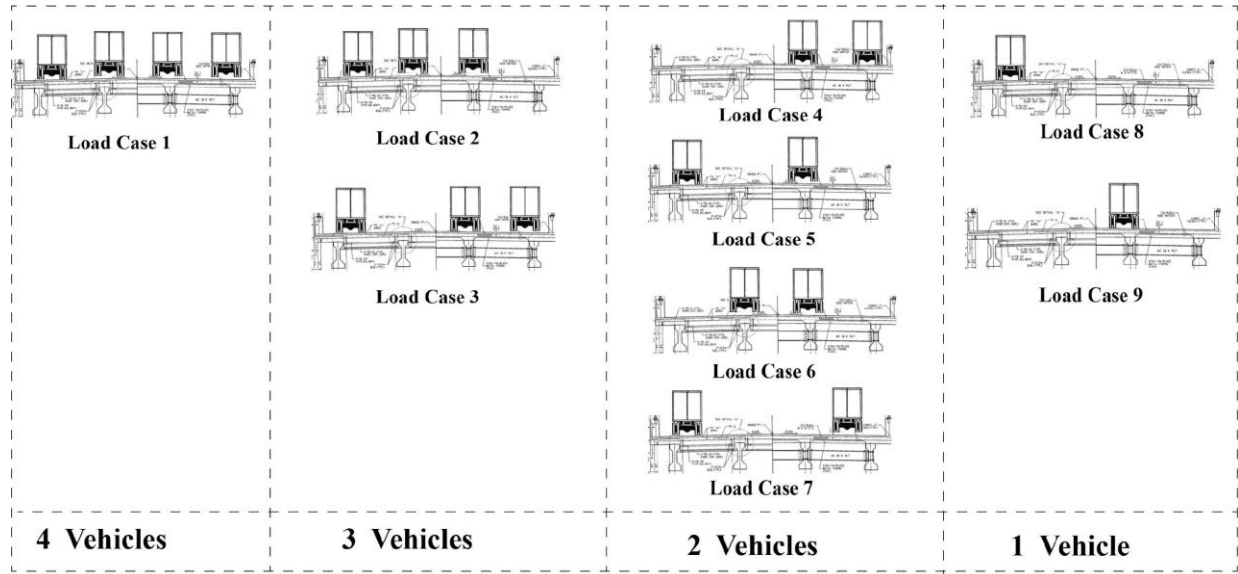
Critical load cases, considering pattern loading for two column bent cap.
